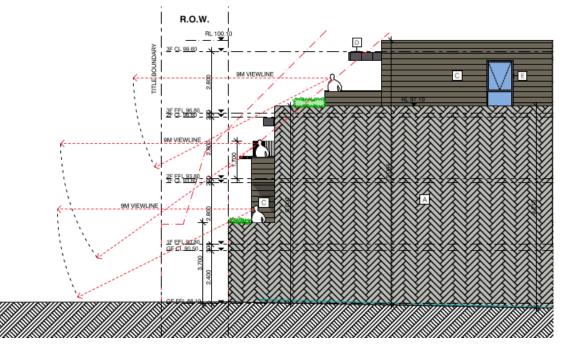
Section diagram depicting distant and not downward views to the north to address overlooking.
